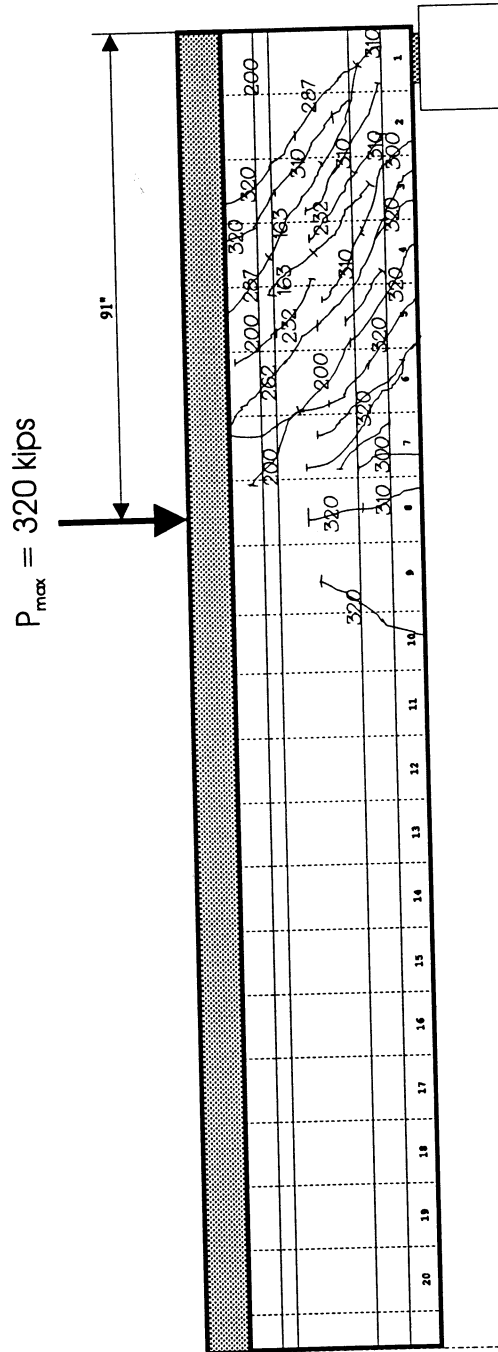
Cracking Pattern for Girder R-12-S
